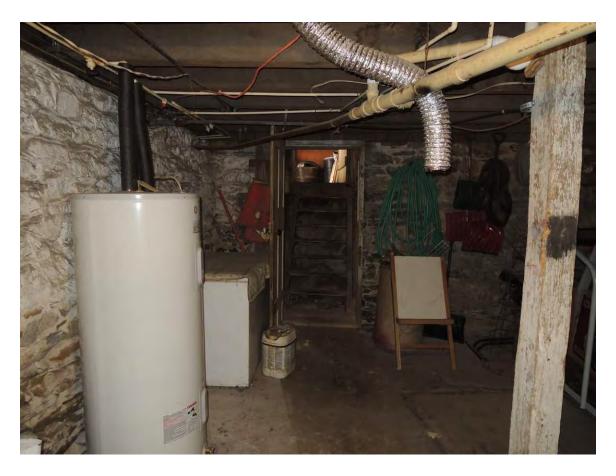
Mifflin House, Cellar, North Room, view across room towards stairs from Addition.
